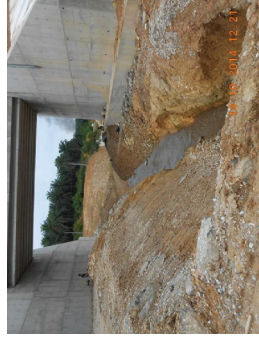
Exposed slope has yet to be protected (relocation road under bridge).
